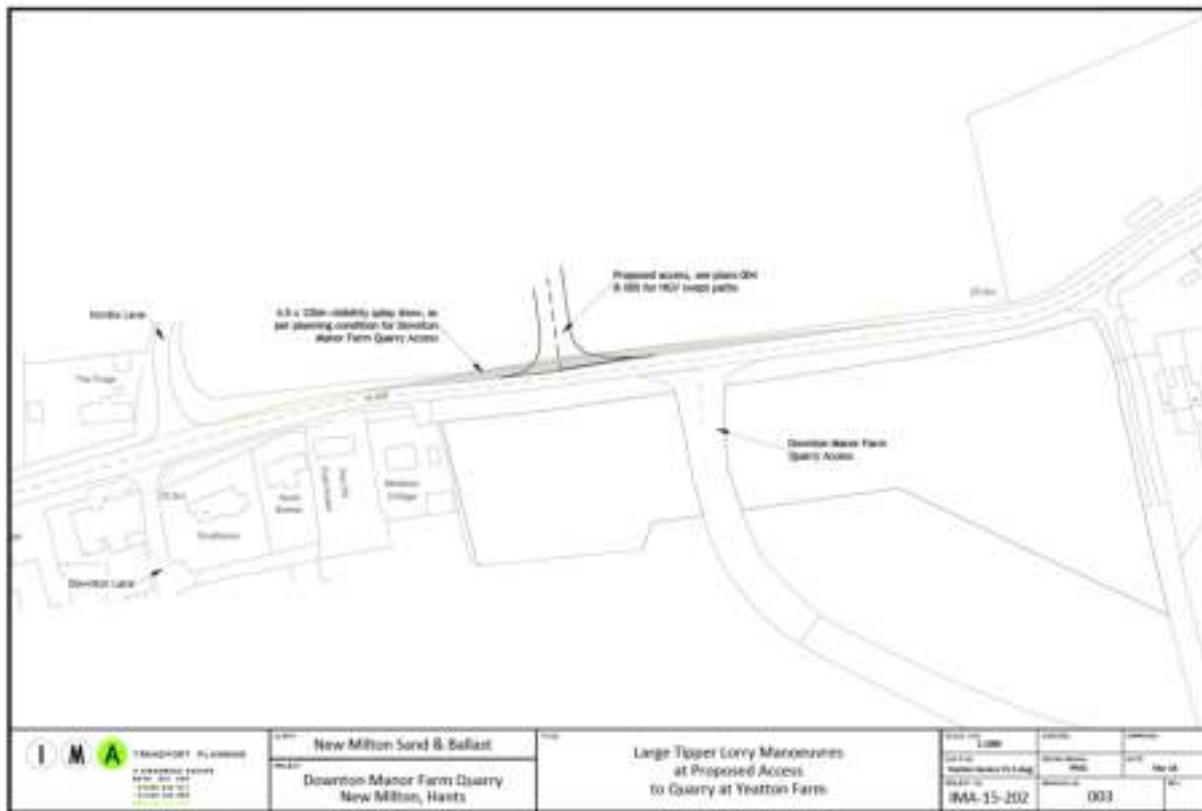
Proposed Site Access to Yeatton farm from A337 Lyminster Road
